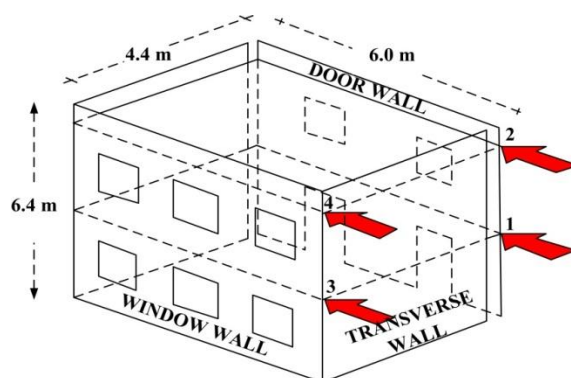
Unreinforced masonry building tested at Pavia University (Belmouden and Lestuzzi, 2009)
